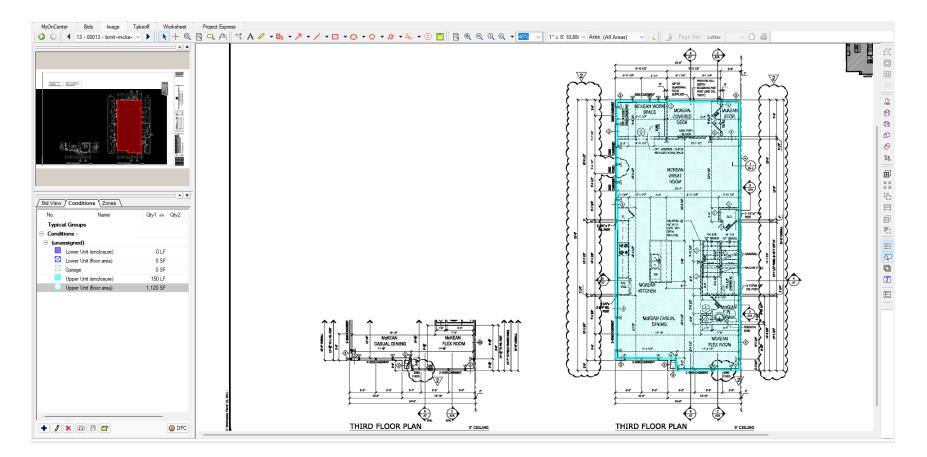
Site-built test unit floor plans, level 3 (project 3)
